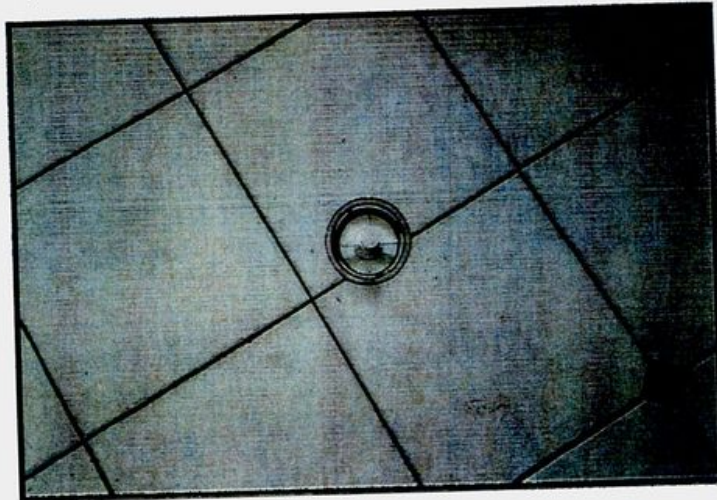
Preparation of flood testing of first floor bathrooms – see stopper at floor waste.
